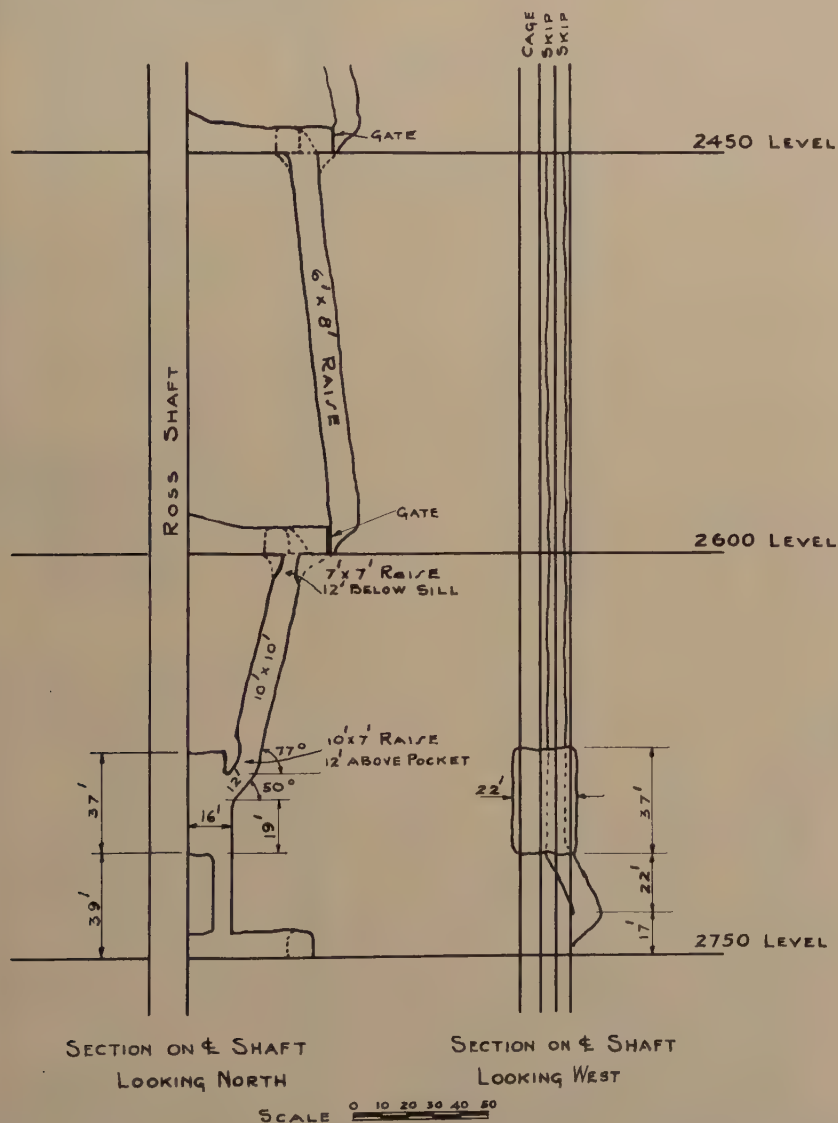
SECTIONS SHOWING GENERAL ARRANGEMENT OF SKIP POCKET AND ORE RAISES.
